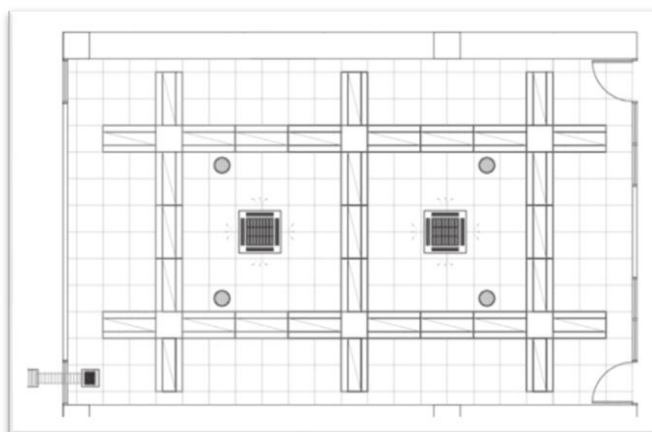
Skate Plan for Lights Set up and Air Conditioners Installed in a Digital Classroom
